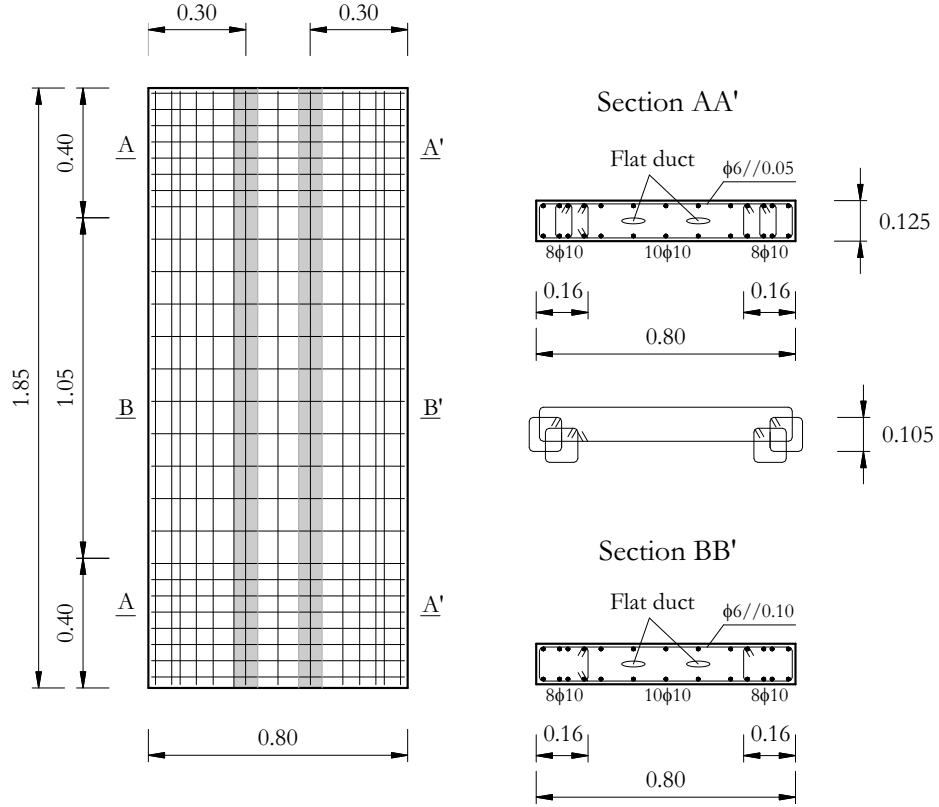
Reinforcement details of specimens RM1 and RM2 wall.
